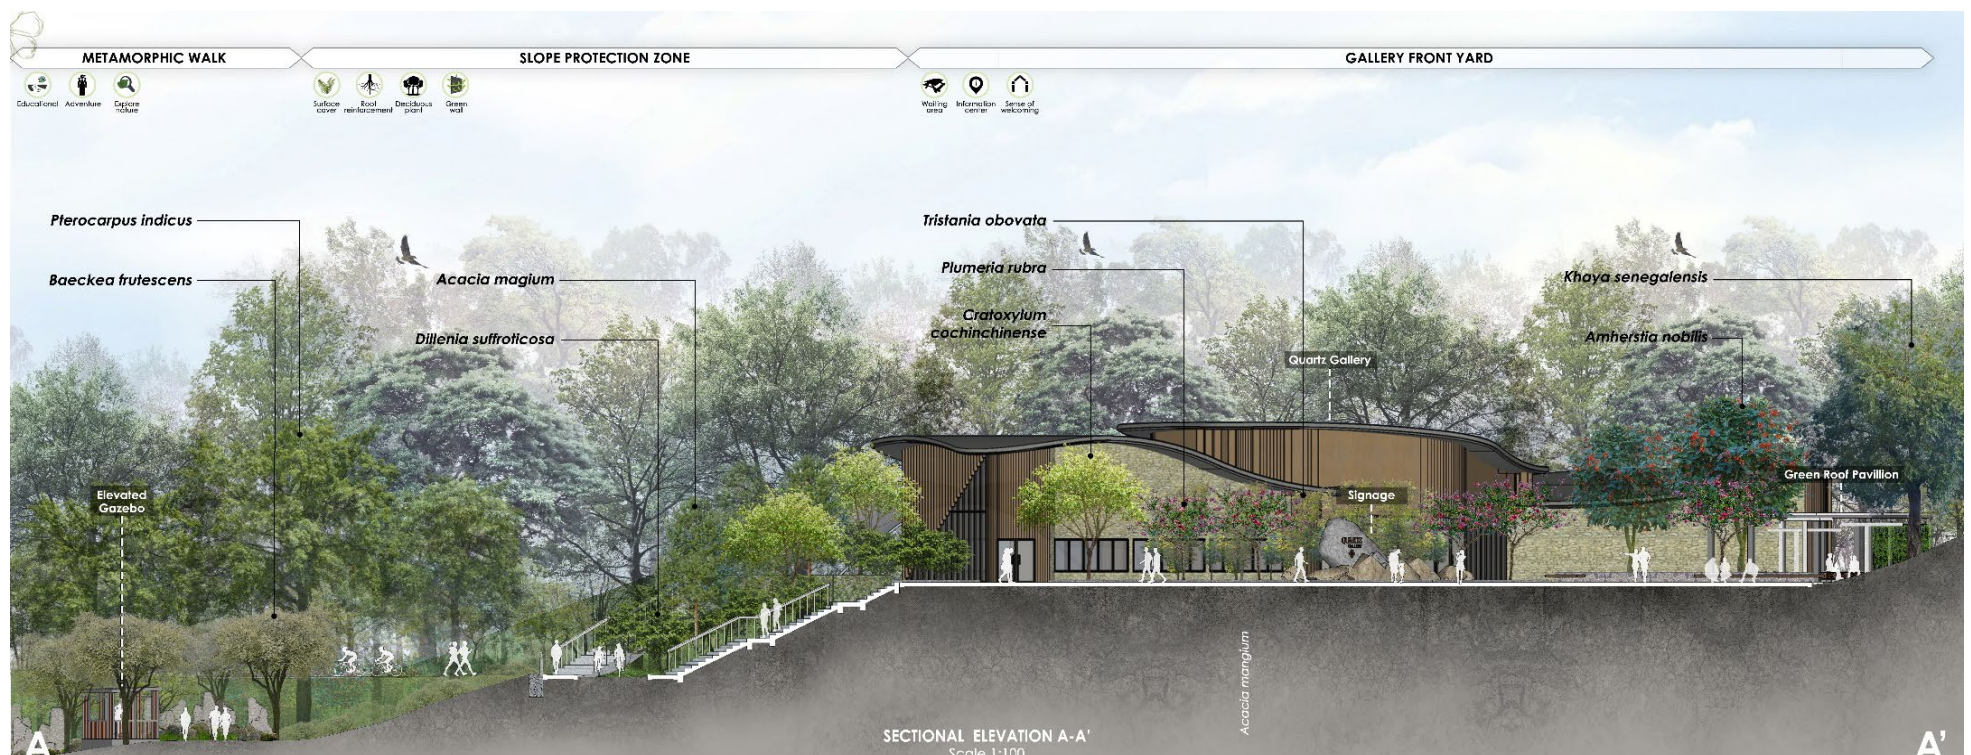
Sectional-Elevation A-A' shows the front yard of Quartz gallery, transition area and Metamorphic walk
